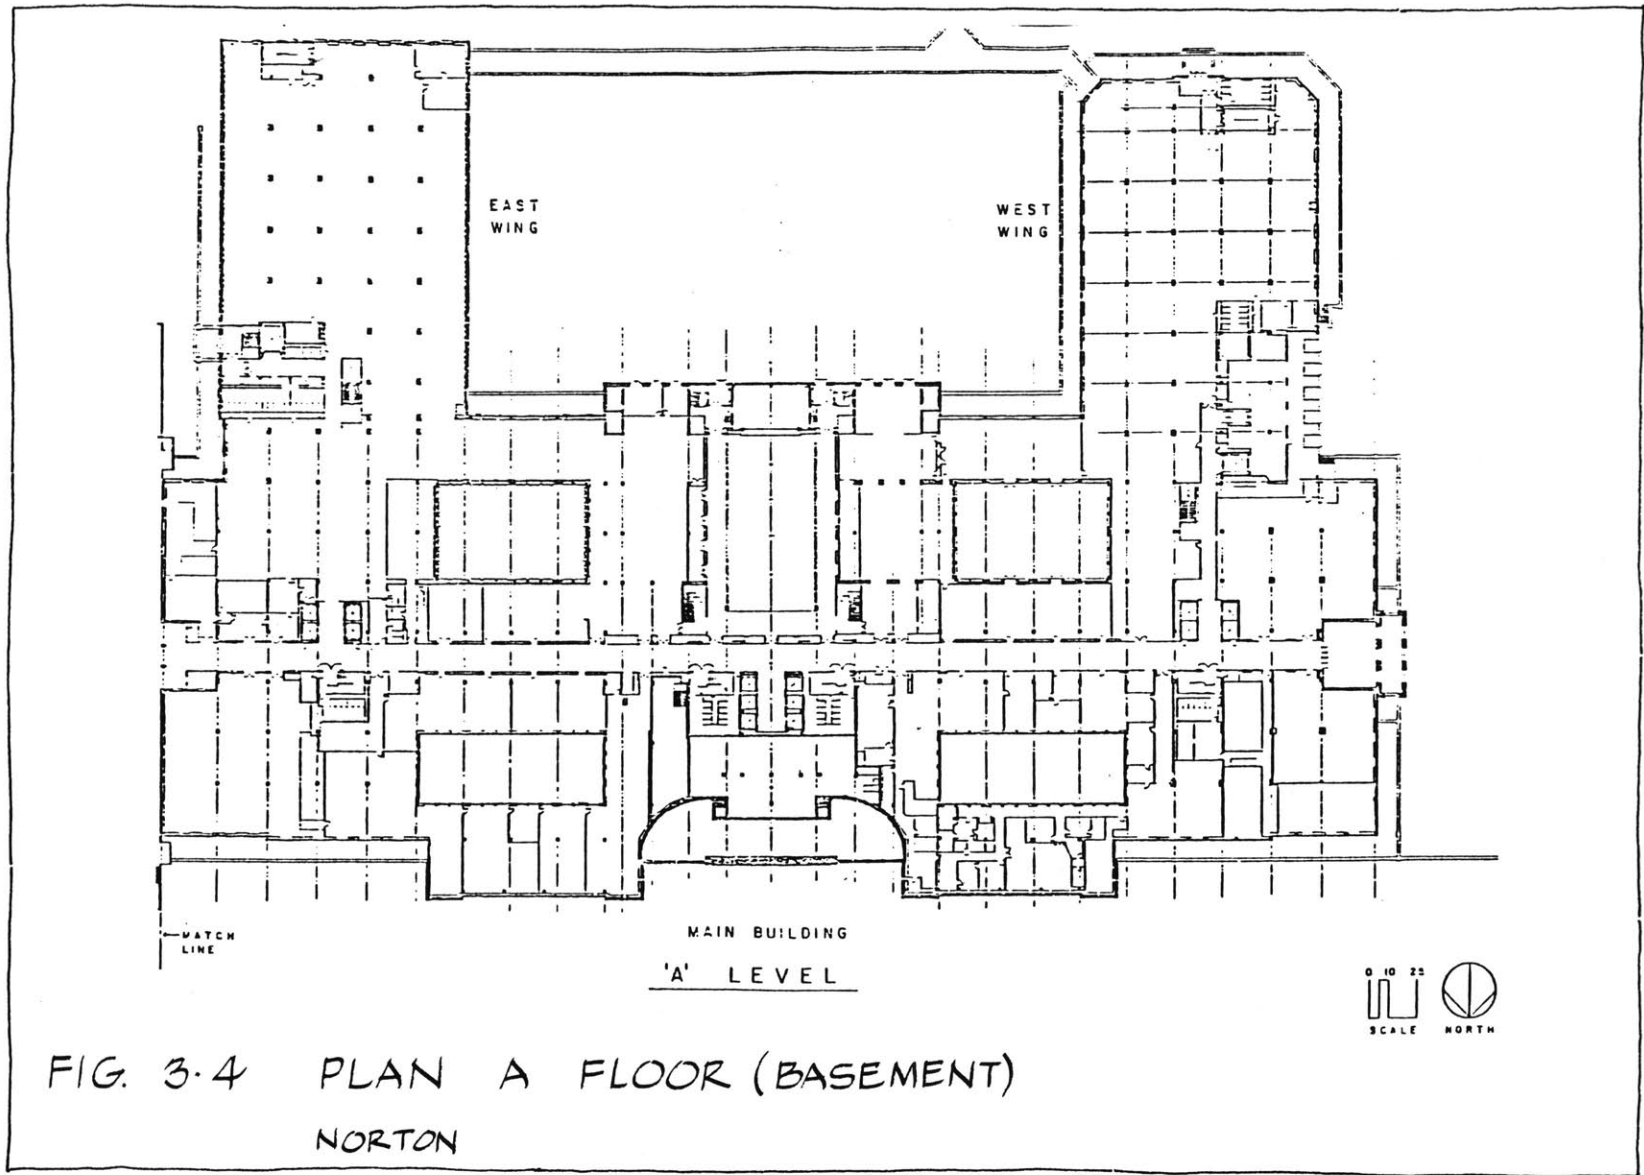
PLAN A FLOOR (BASEMENT)
